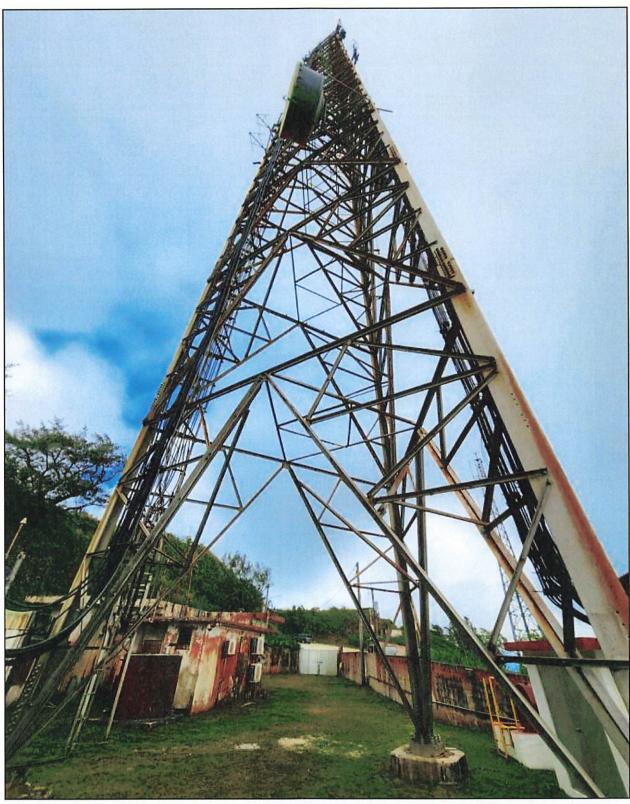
View northwest from base of existing tower (photo: D. Perzinski, 6/15/23).
